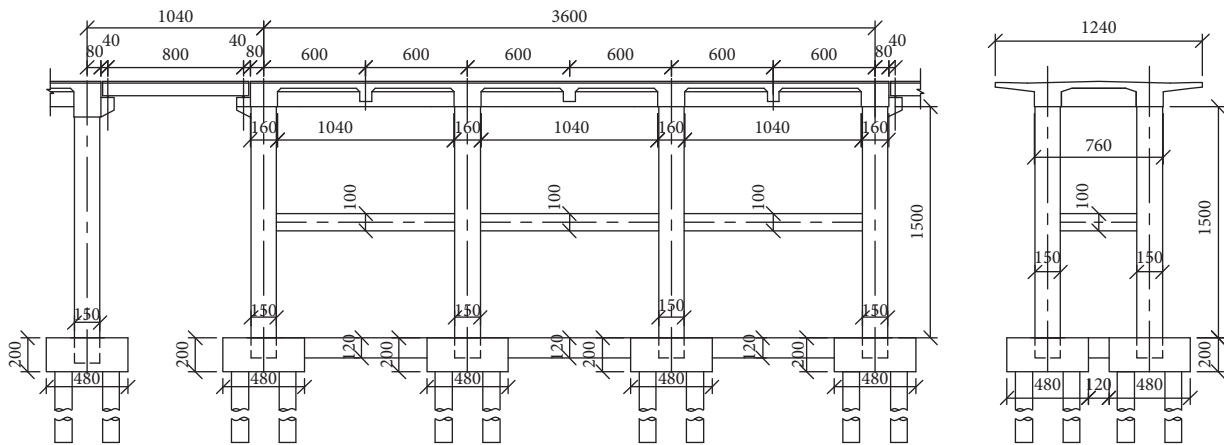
Elevation and cross-section of a RC rigid frame (unit: cm).
